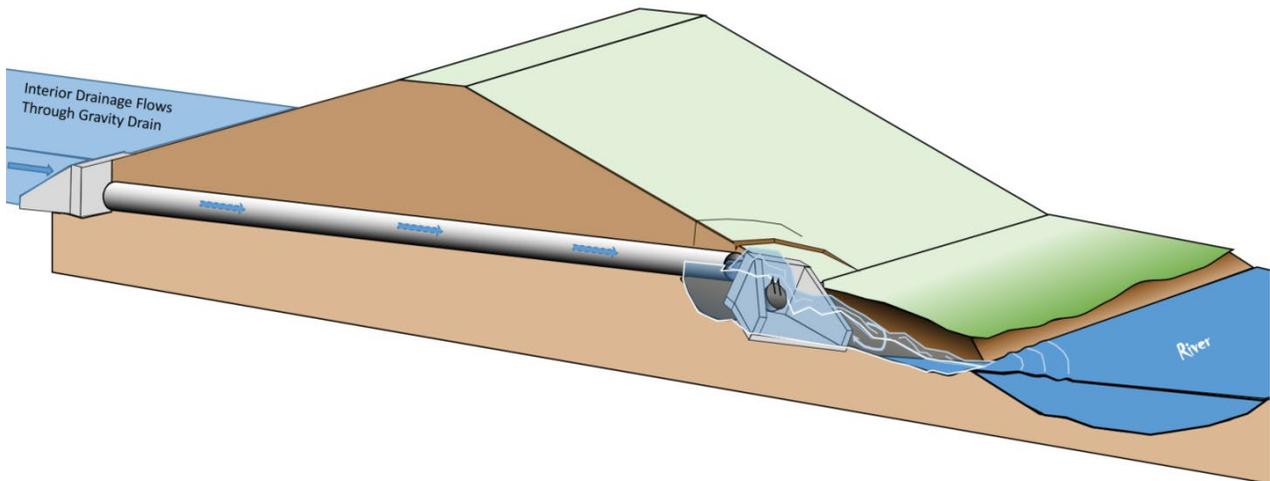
Excessive erosion destabilizes the headwall and causes a loss of outlet control.
